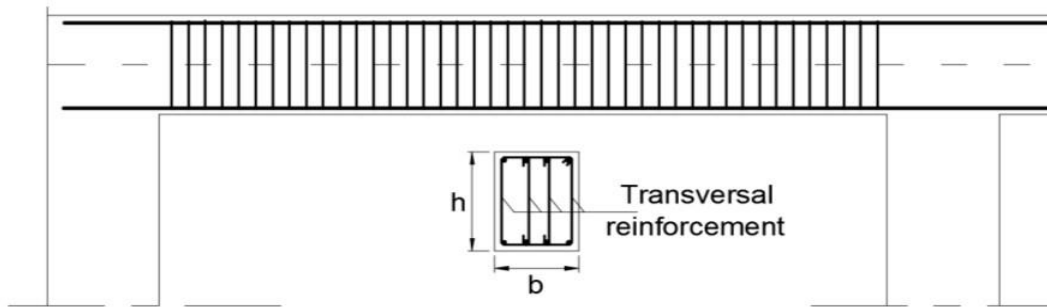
Longitudinal and transversal beam section with transversal reinforcement
